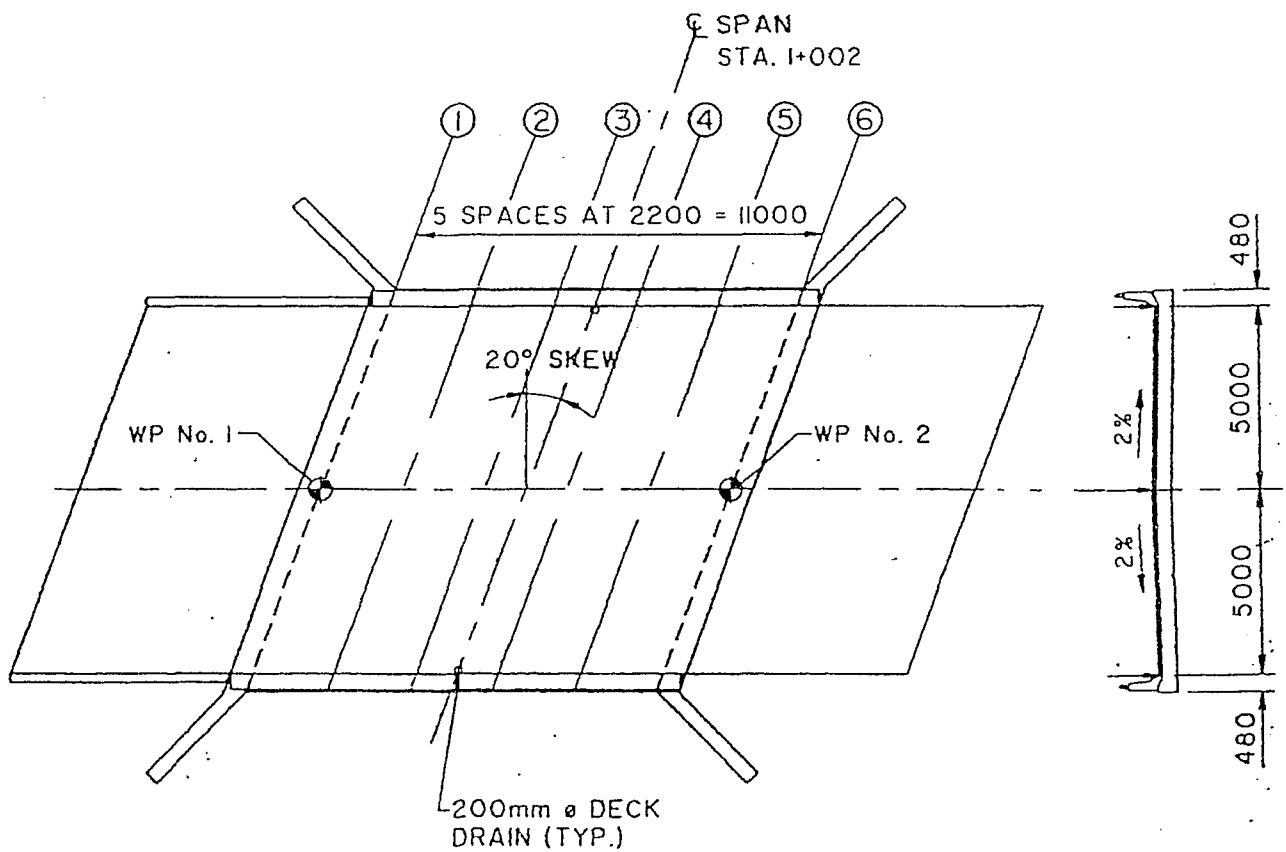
Key plan and screed elevations, 19th Ave. bridge, Markham, Ontario
